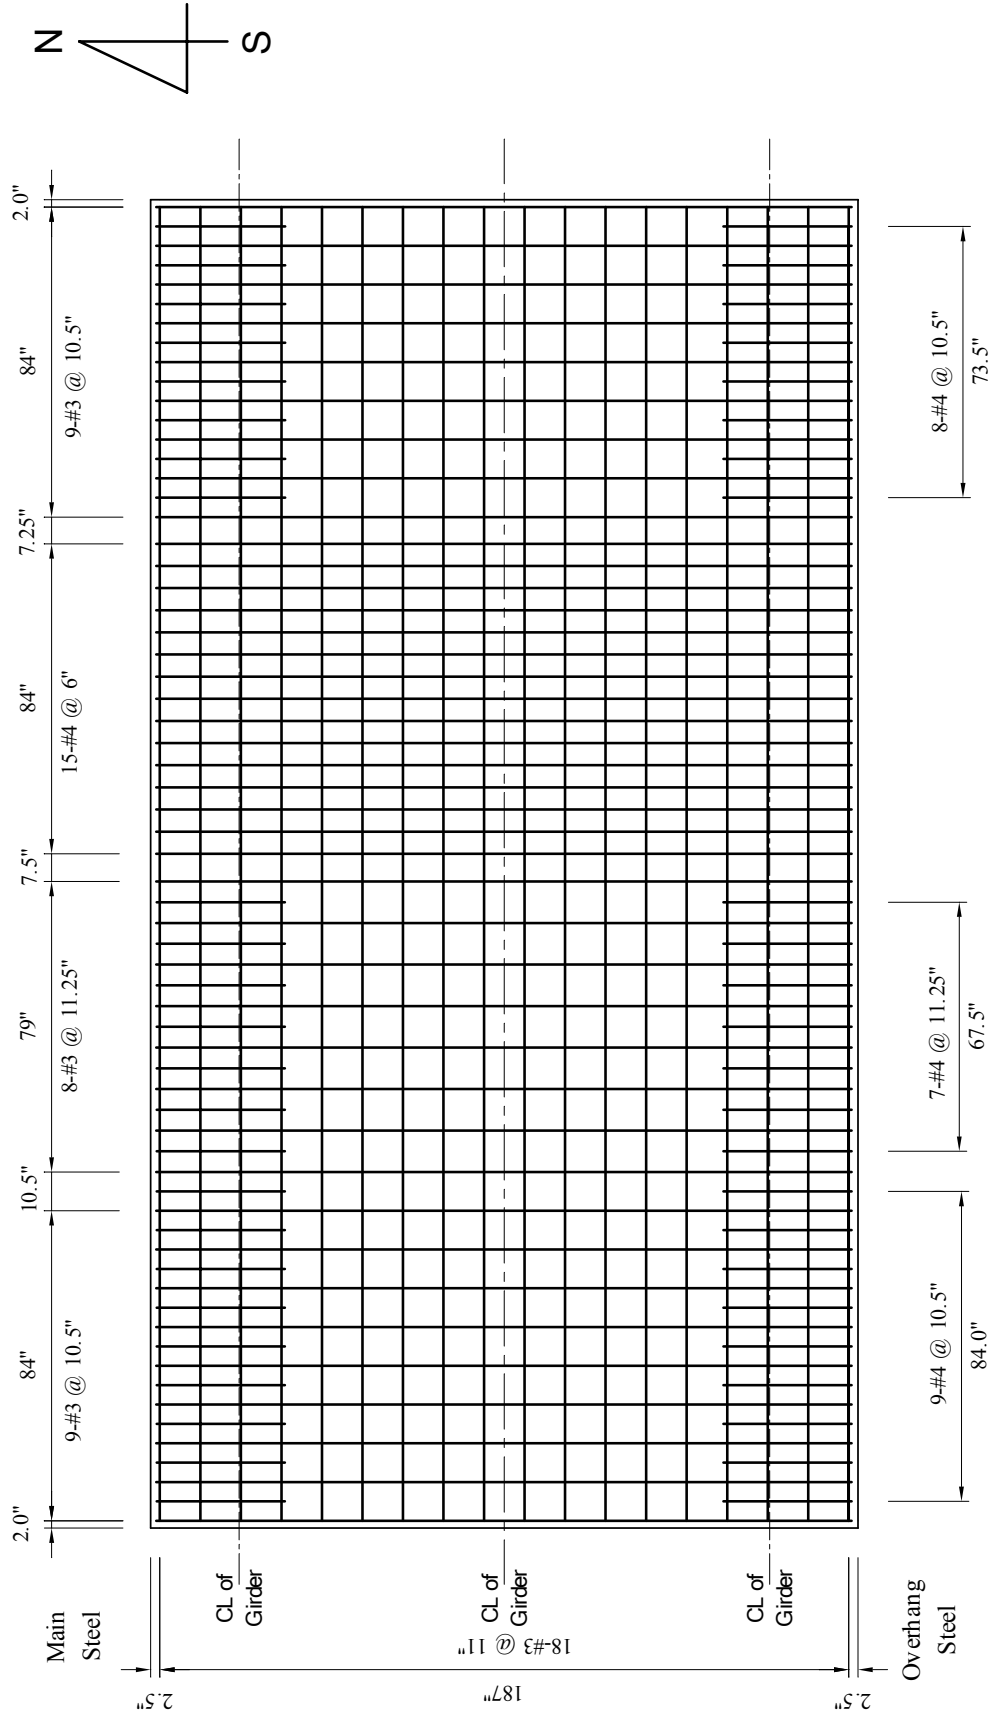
Plan View of Top Reinforcement (Support to Support only)
